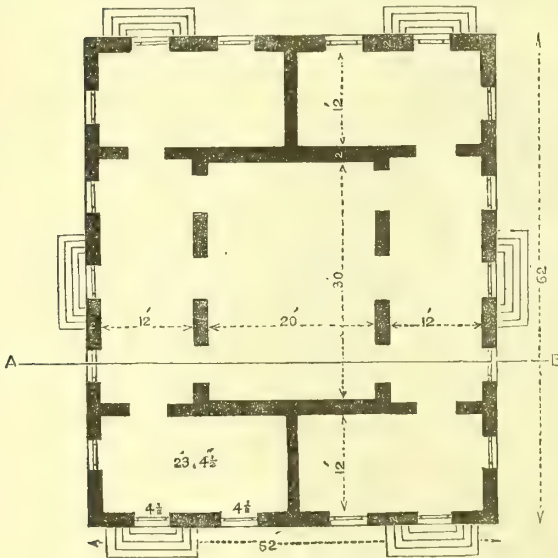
PLAN AND SECTION OF THE EUROPEAN INFANTRY HOSPITAL, BANGALORE.
